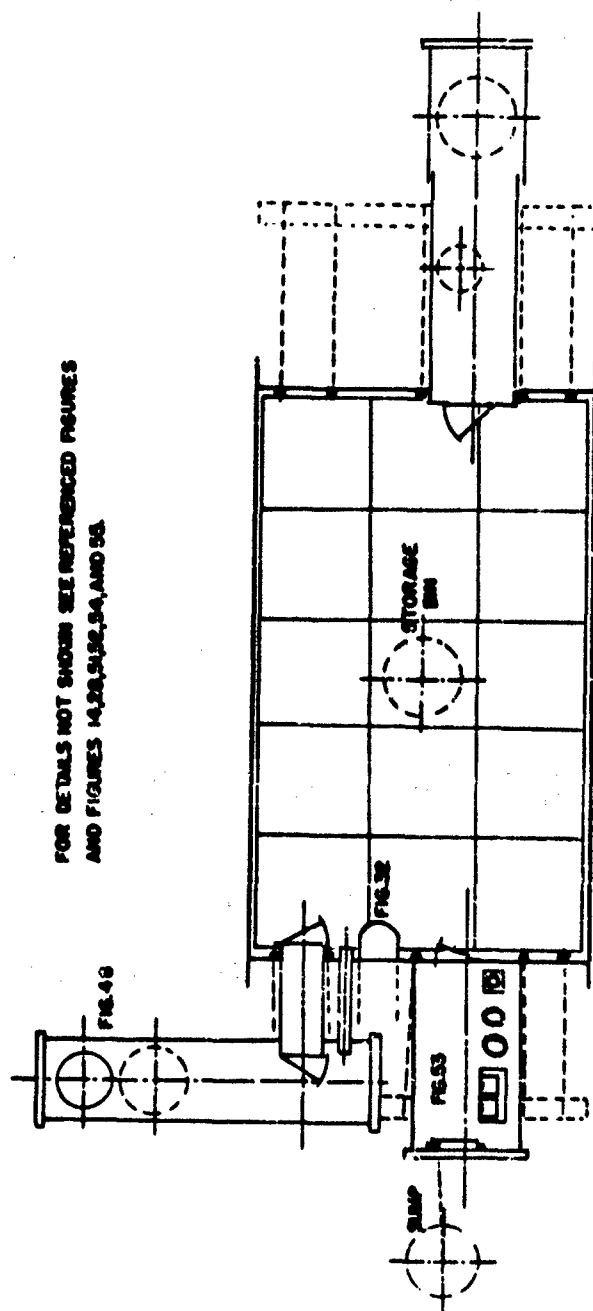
Example of continuous occupancy working station; floor plan with sections.
